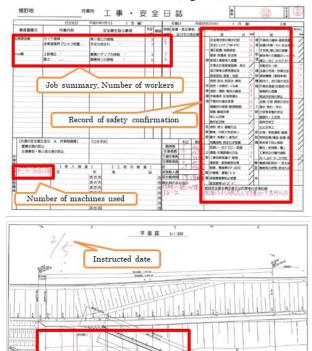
Examples of collected daily reports (upper) and construction instructions (under)
